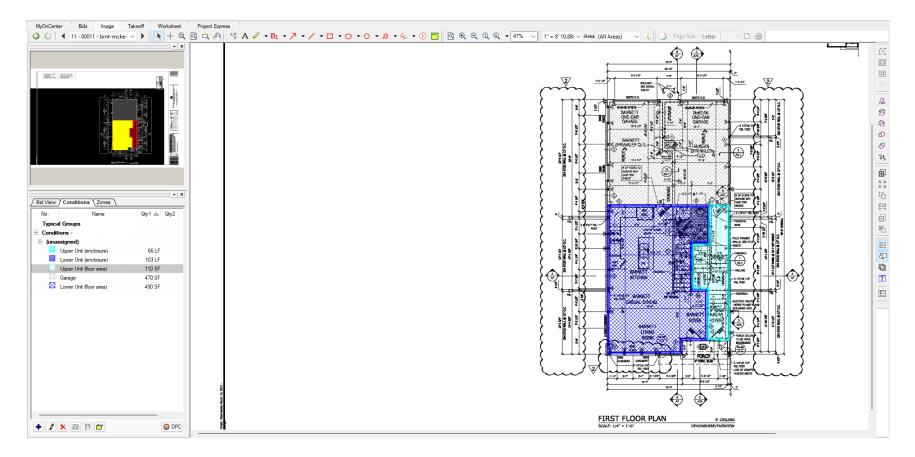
Site-built test unit floor plans, level 1 (project 3)
